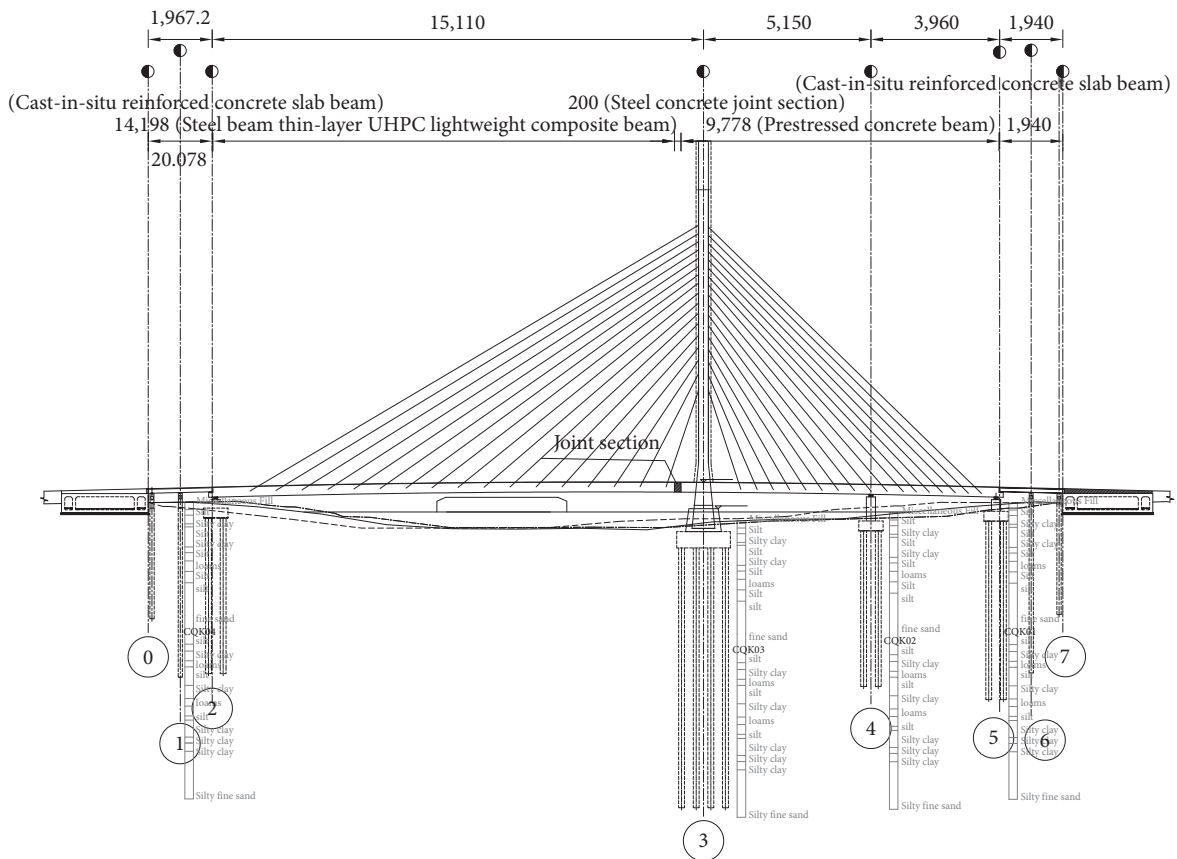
Elevation of Zhonghua Road Bridge in Liaocheng (unit: cm, the same below).
